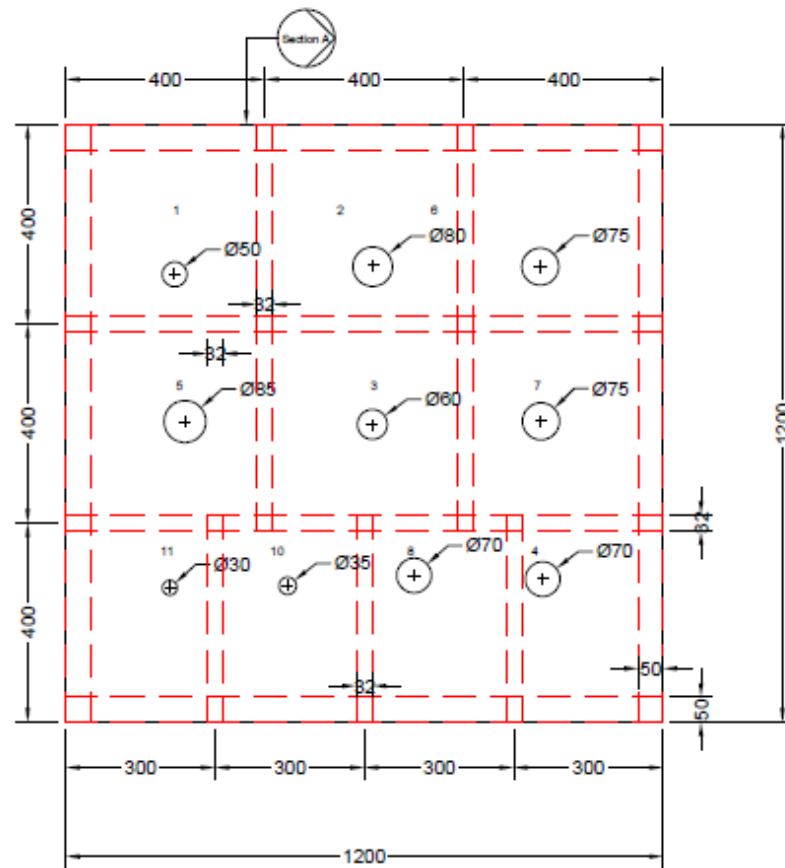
Test 2 – Elevation – Fire Side.pdf
